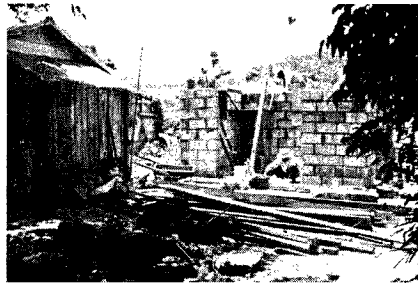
Inclined concrete block walls of a house, Zaha, OKINAWA.
